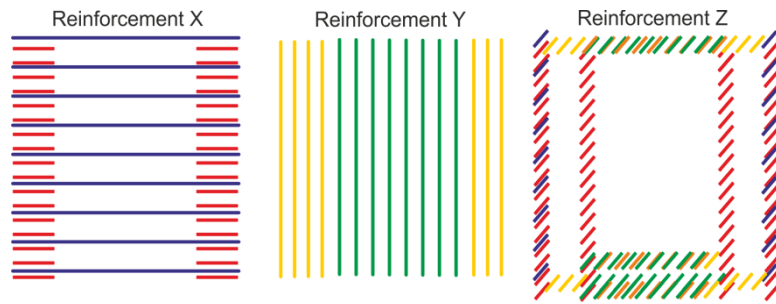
DETAILS OF THE REINFORCEMENT IN EACH DIRECTION
